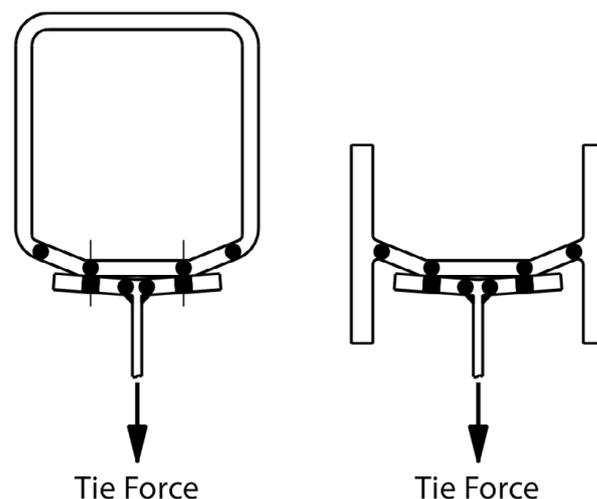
Behaviour in a one-sided connections to webs and hollow sections
